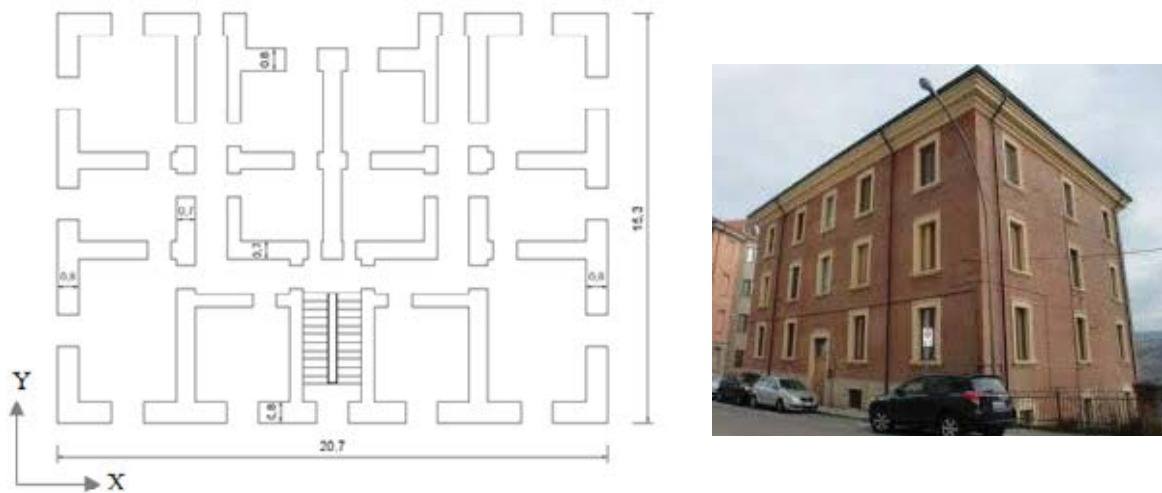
MUR1,Hr,Reg,Nc building typology: plan geometry of the first story (left) and a picture (right).
